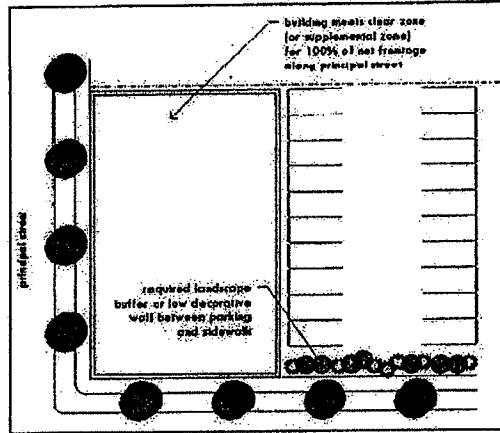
Corner Site on a Suburban Roadway (shown as "principal street")
